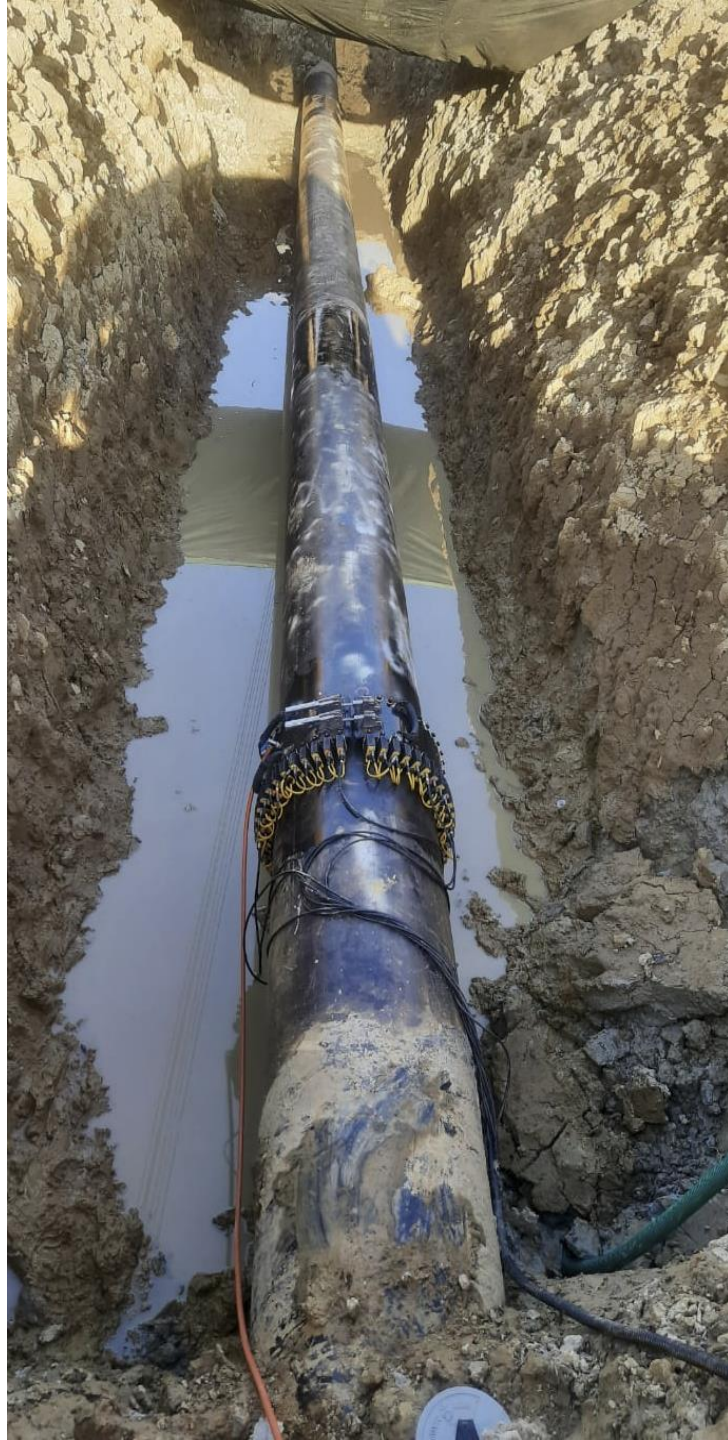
Magnetic Particle Inspection (MPI) for Stress Corrosion Cracking (SCC) for Pipe Body, ERW Seam as well as Girth Welds
